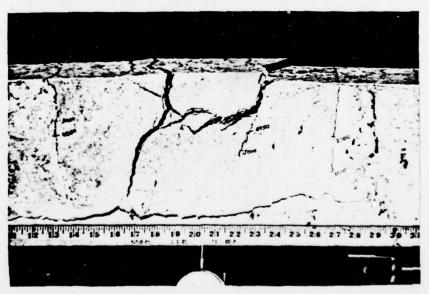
Failure of Beam T-6-P. Ultimate load = 5.25 kpj. Splice length = 6 inches.
